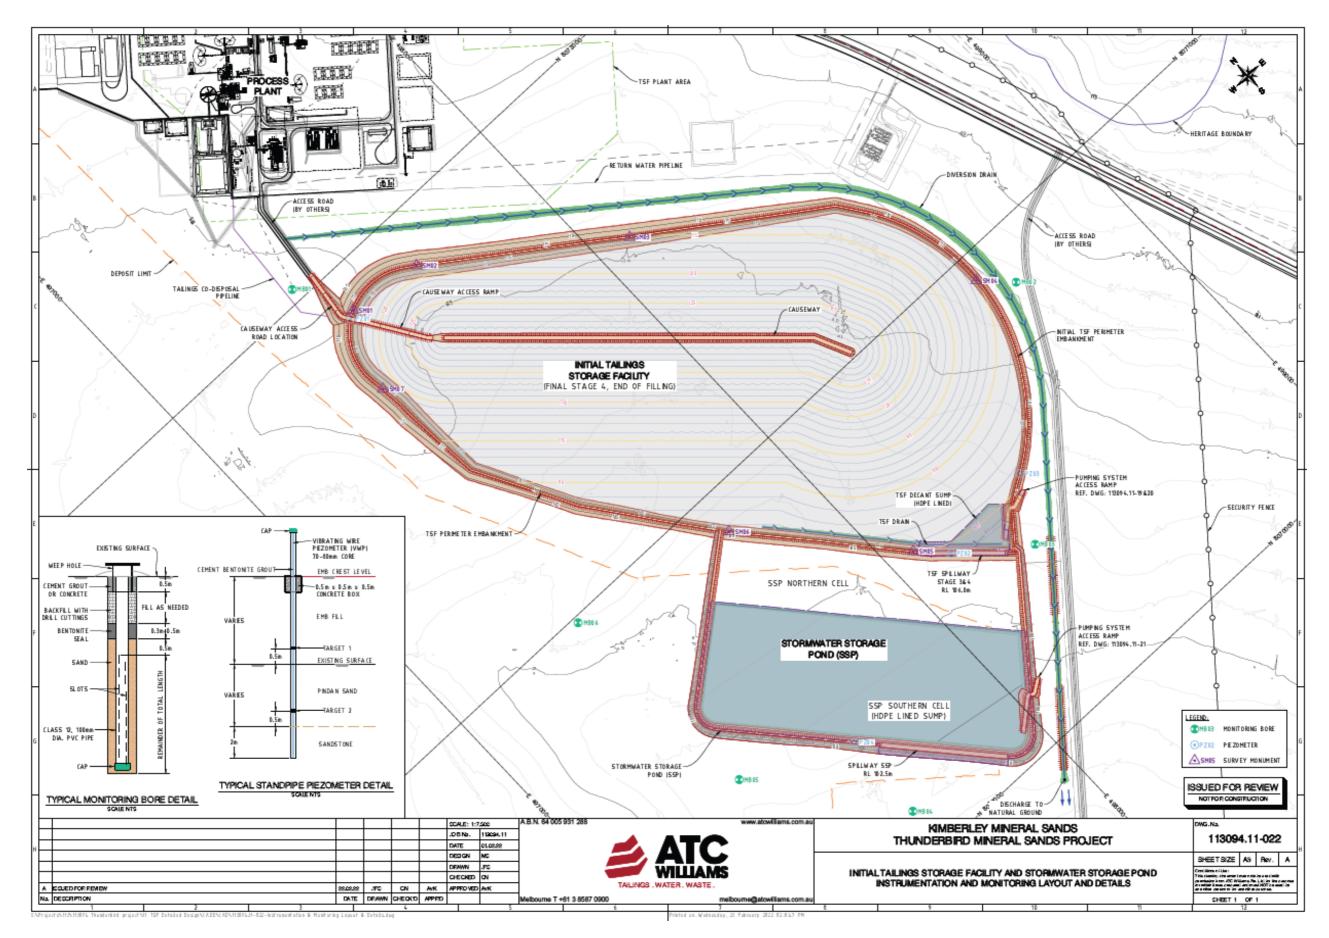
Drawing – Initial TSF and SPP, instrumentation and monitoring layout and details
